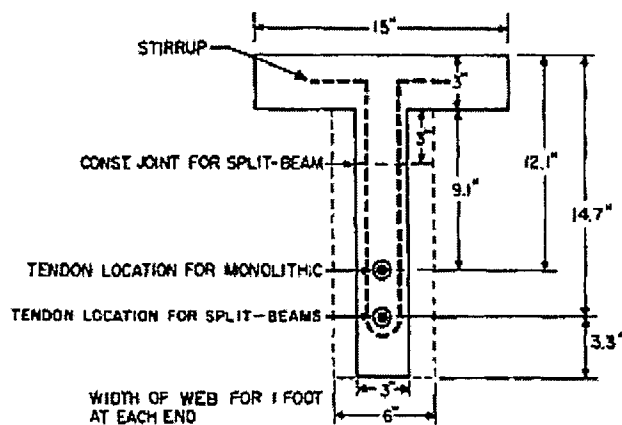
Cross-Section of Beam Tested by Bryson and Carpenter
